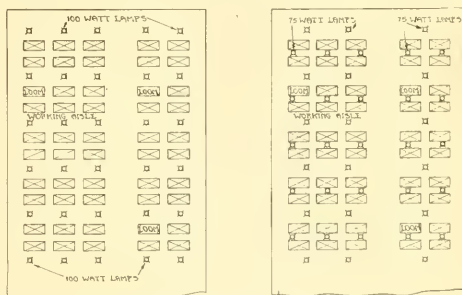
TYPICAL PLACING OF OUTLETS FOR THE LIGHTING OF LOOMS
